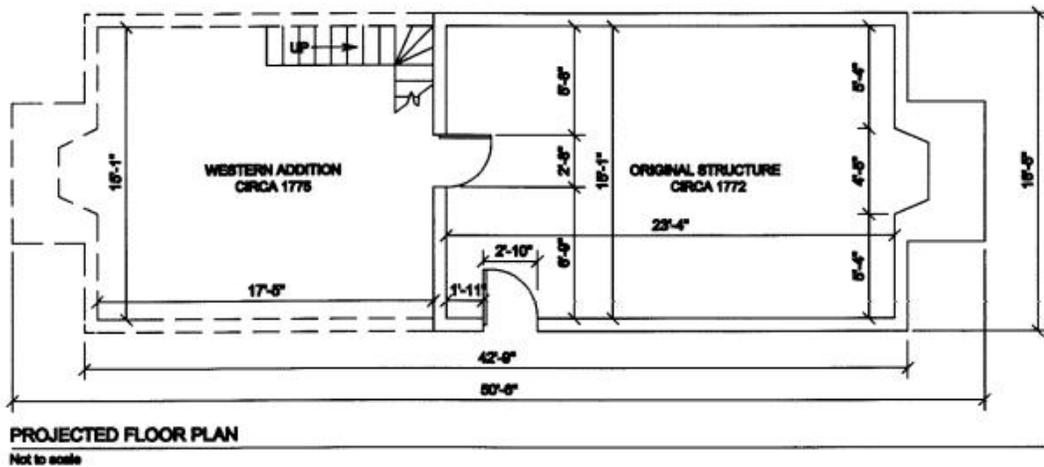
Projected floor plan of Ingles public house predating 1823.
